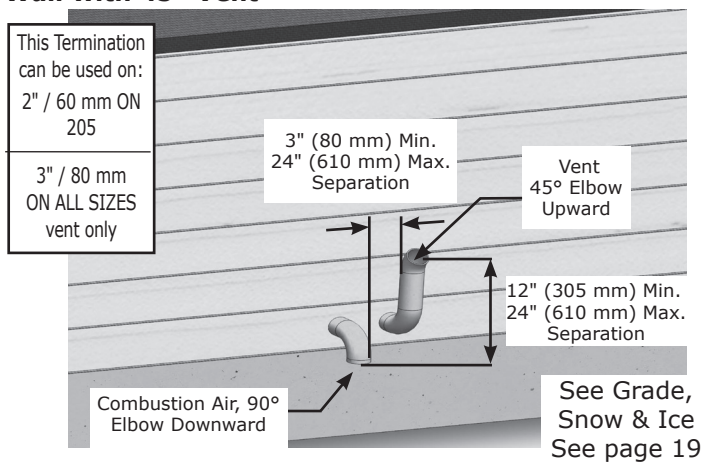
(3" / 80 mm ONLY) Twin Pipe Side Wall Vent
